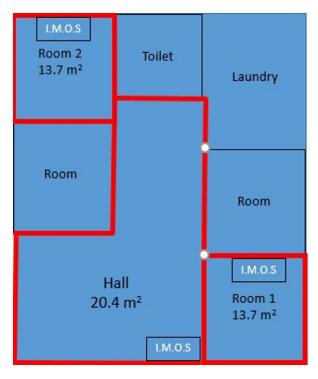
The size of hall, room 1 and room 2 at 17th College, UPM
